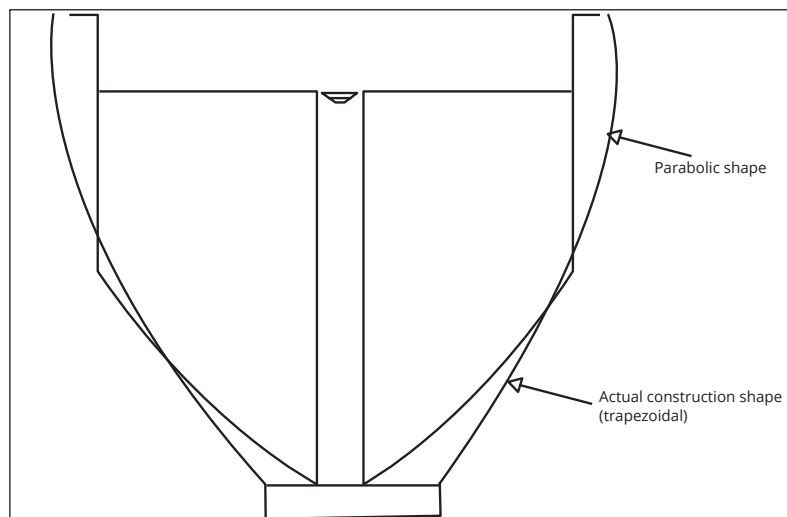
Typical Trapezoidal Section of a Grit Channel
